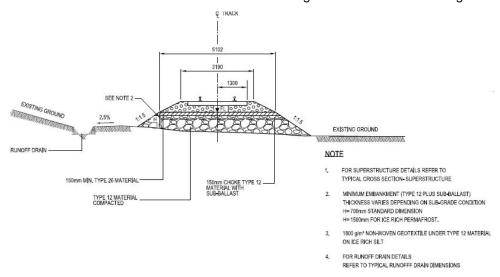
Typical Cross Section Railway Embankment on Soil – Section III
